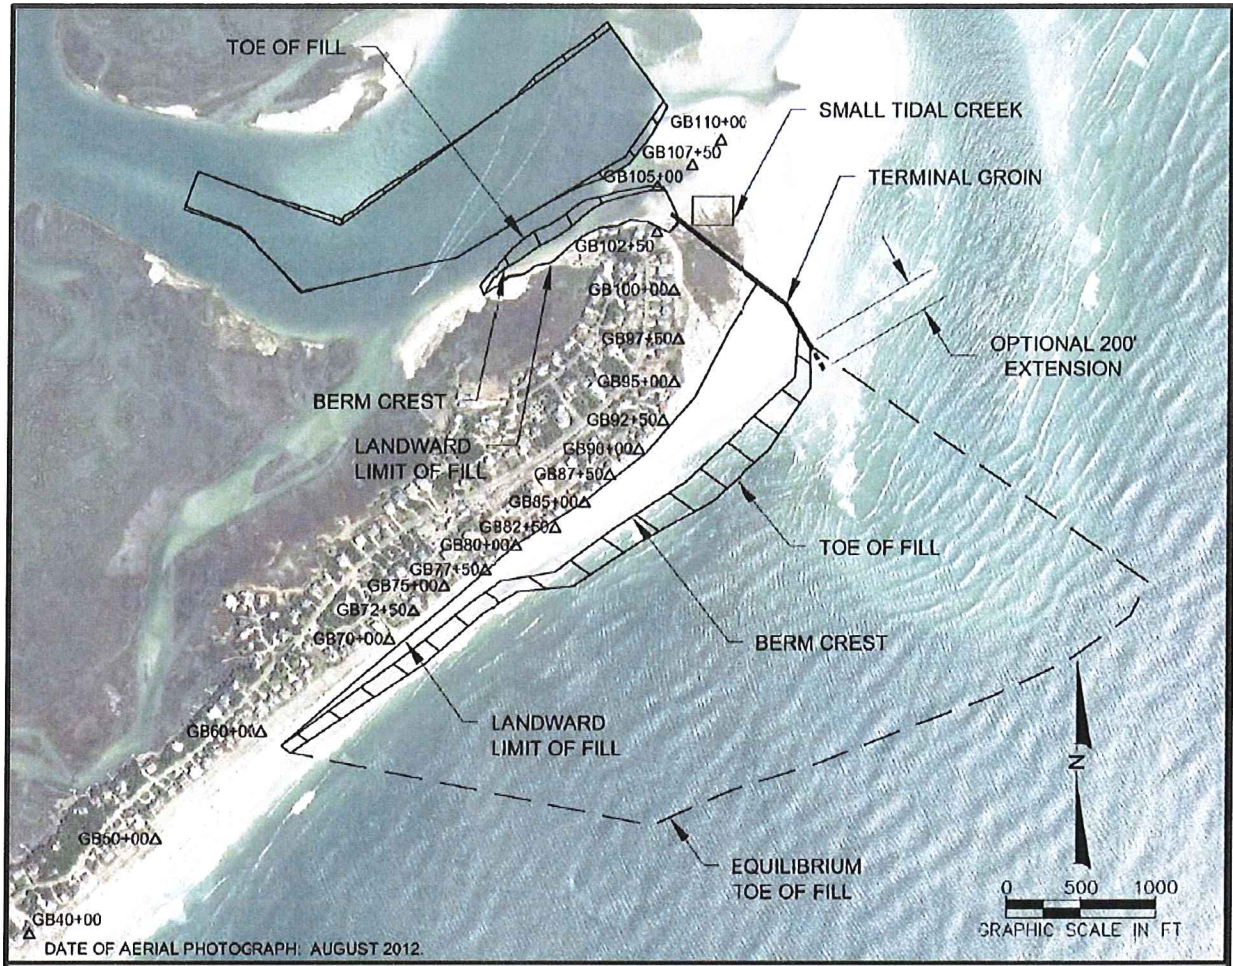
Plan view of Alternative 5D; 2012 shoreline conditions.
